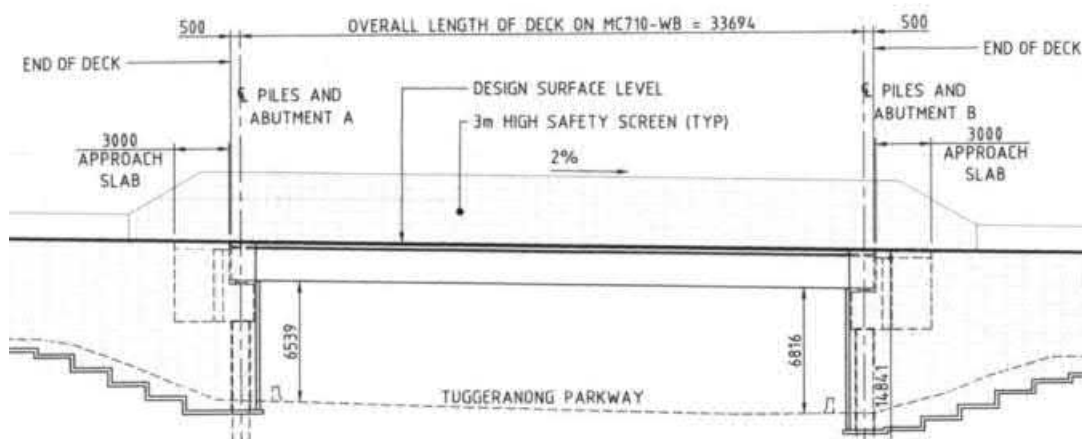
Typical cross section – Bridge over Tuggeranong Parkway
